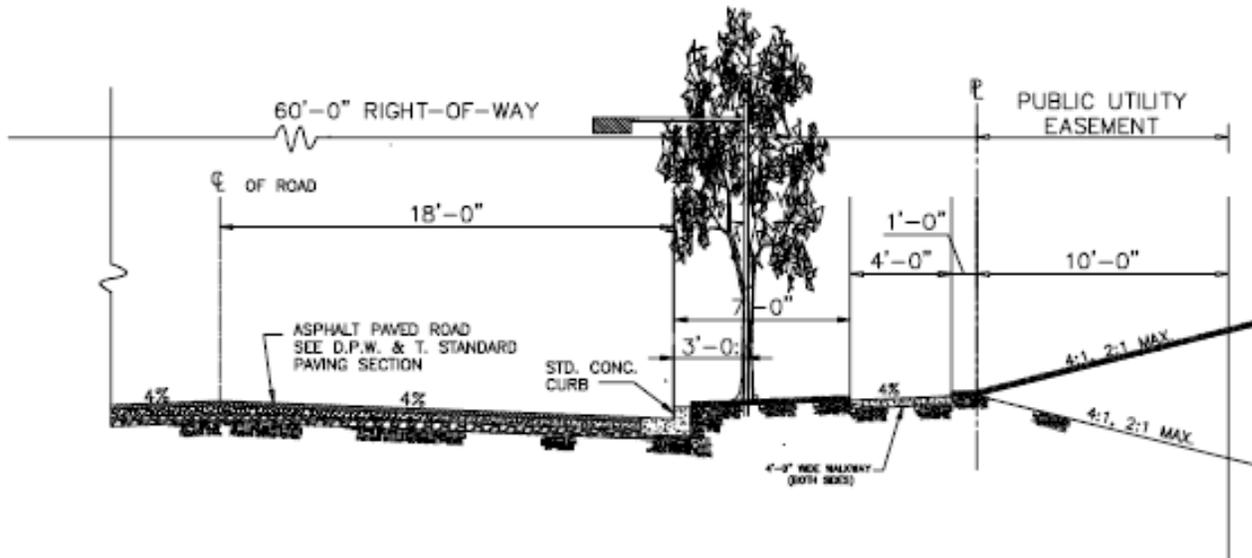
Example of a conventional right-of-way section with pavement width of 36 feet and use of concrete curb and gutter
